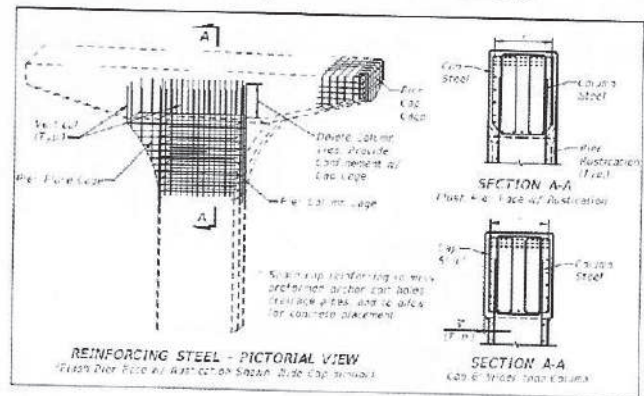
b : Reinforcement detailing as per Structural Detailing manual Florida Department of Transportation.
